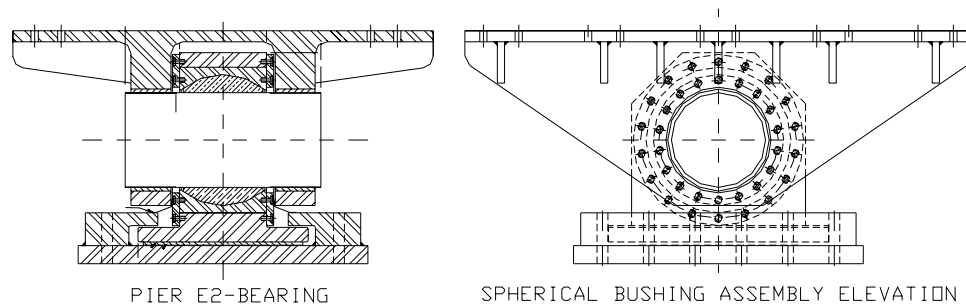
East Pier Bearing - Spherical Bushing Assembly
